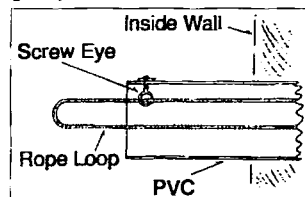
Side view of PVC pipe/cable raceway as it enters the building interior, showing the cable-pulling rope loop idea in the text.
